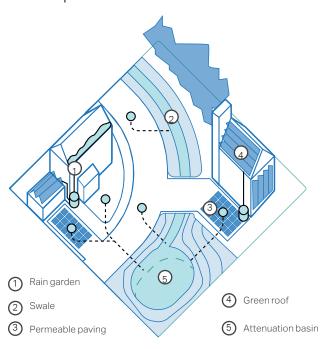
Diagram showing the best use of harvesting water systems rain garden, swales, permeable paving, green roofs
